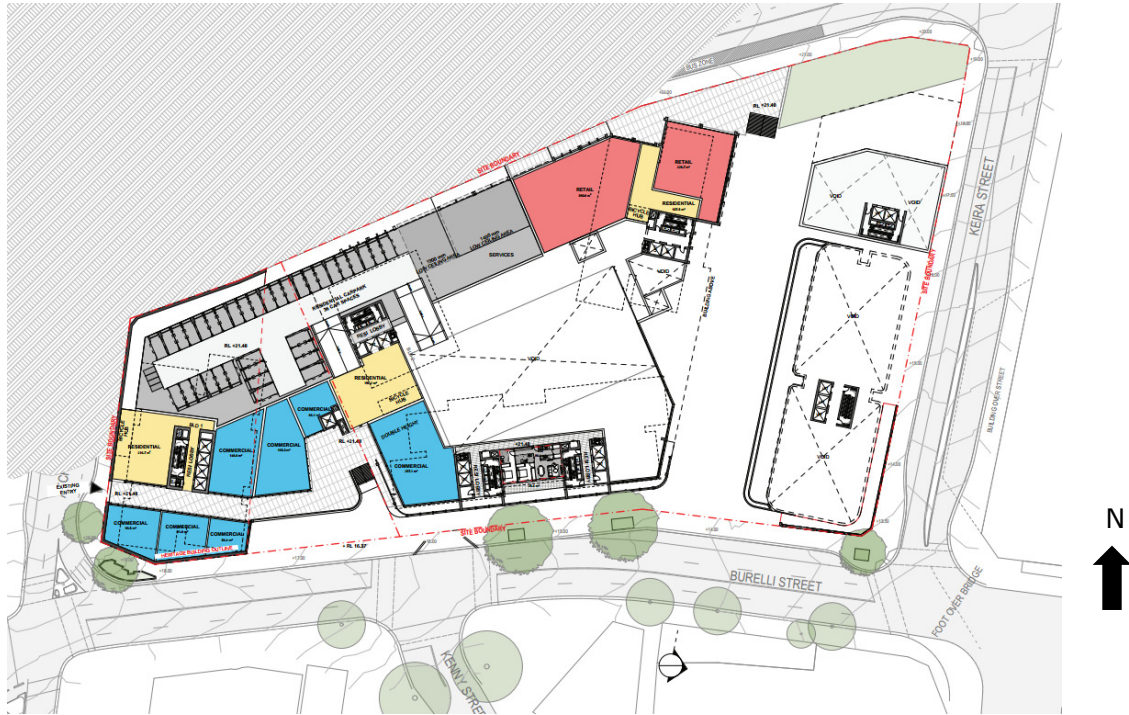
Ground Level Plan of the proposed development (Feb 2025).
